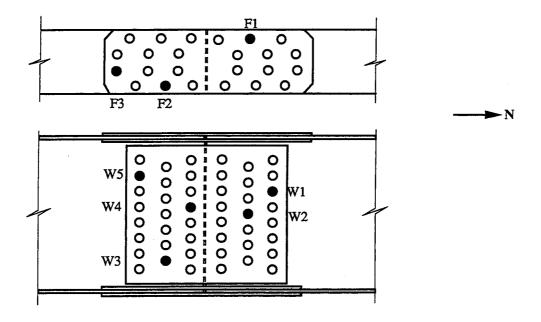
(c) Location of sampled bolts in connection N4 of bridge B1
